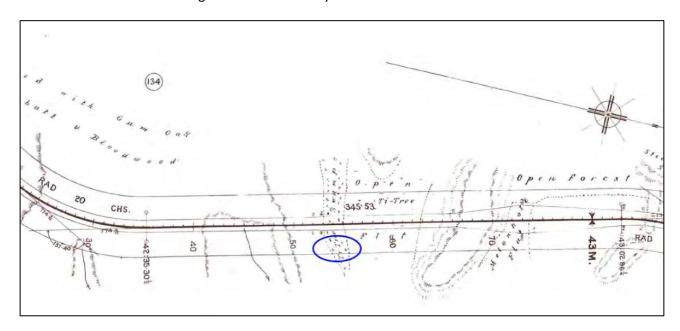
Detail of 1888 Railway Survey Plan showing the existence of 'ti tree swamp' in proximity to the subject site (Source: TMR).
